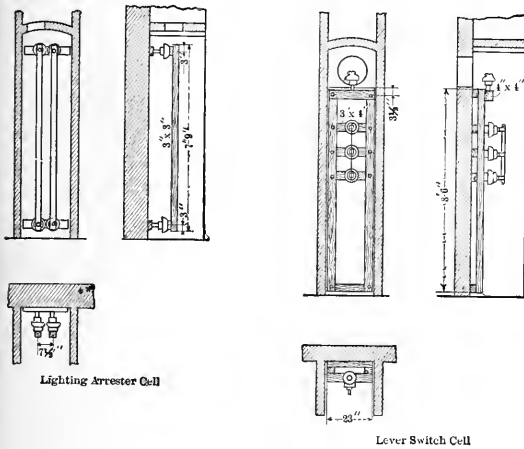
CELL EQUIPMENTS, SCHENECTADY SWITCH HOUSE.
